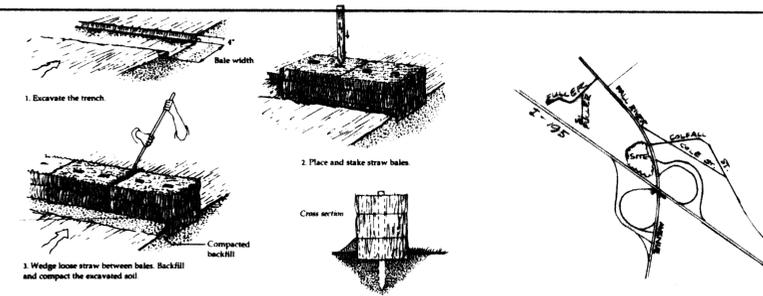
Placement and Construction of a Straw Bale Barrier
